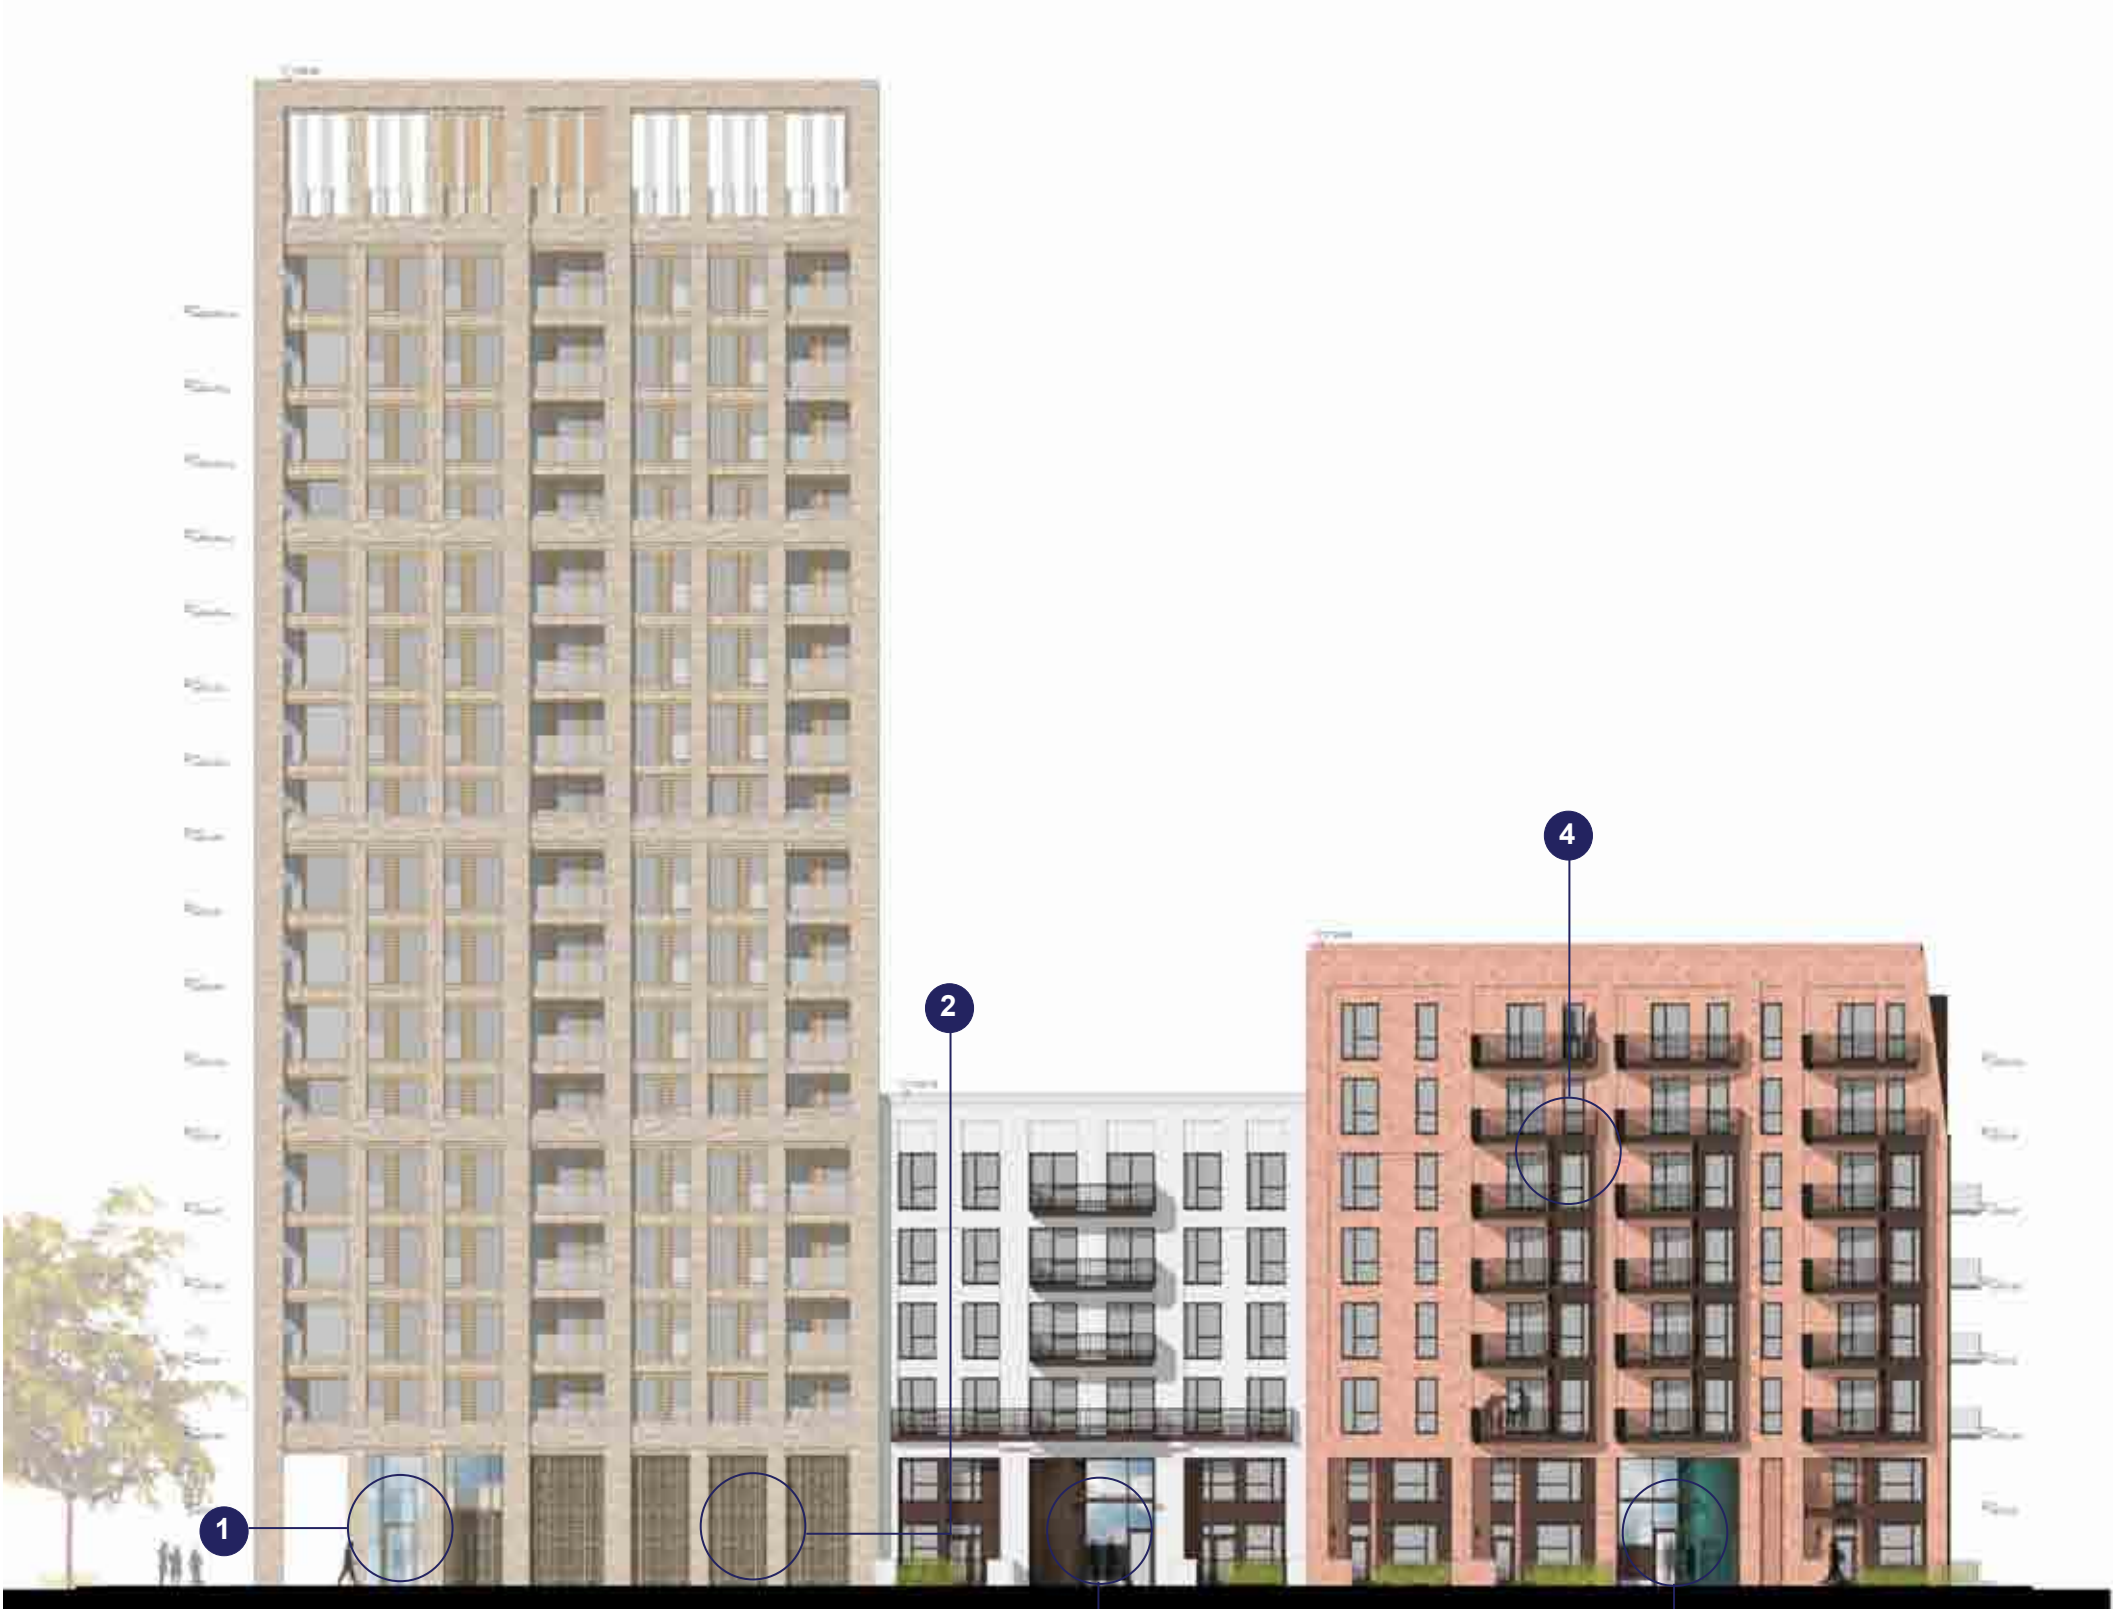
Block 5 East Elevation Revised Planning Submission February 2015
